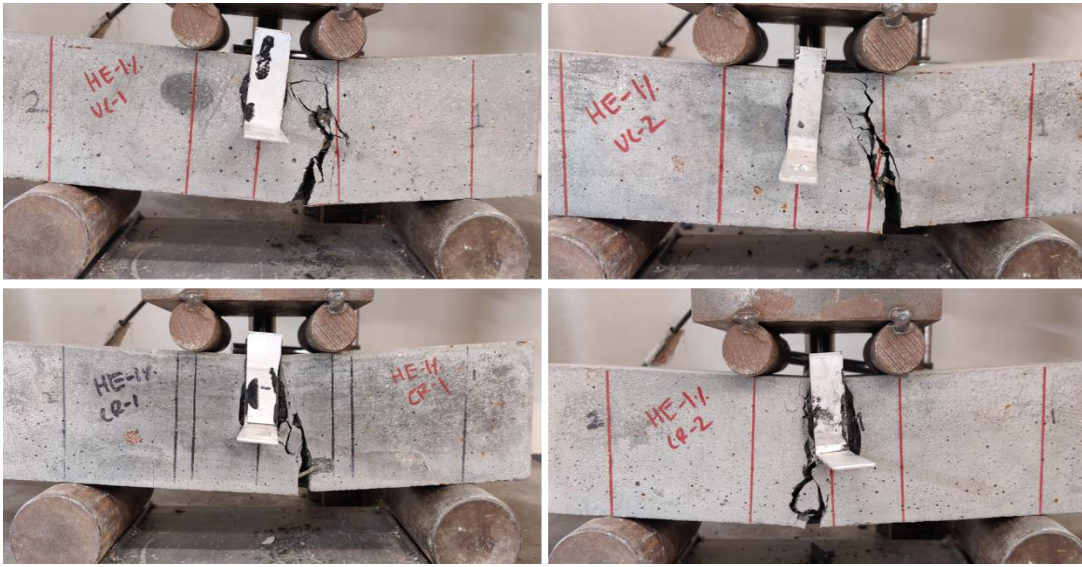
Cracks due to flexural testing for the HE-1% specimens exposed to rapid freezing and thawing.
